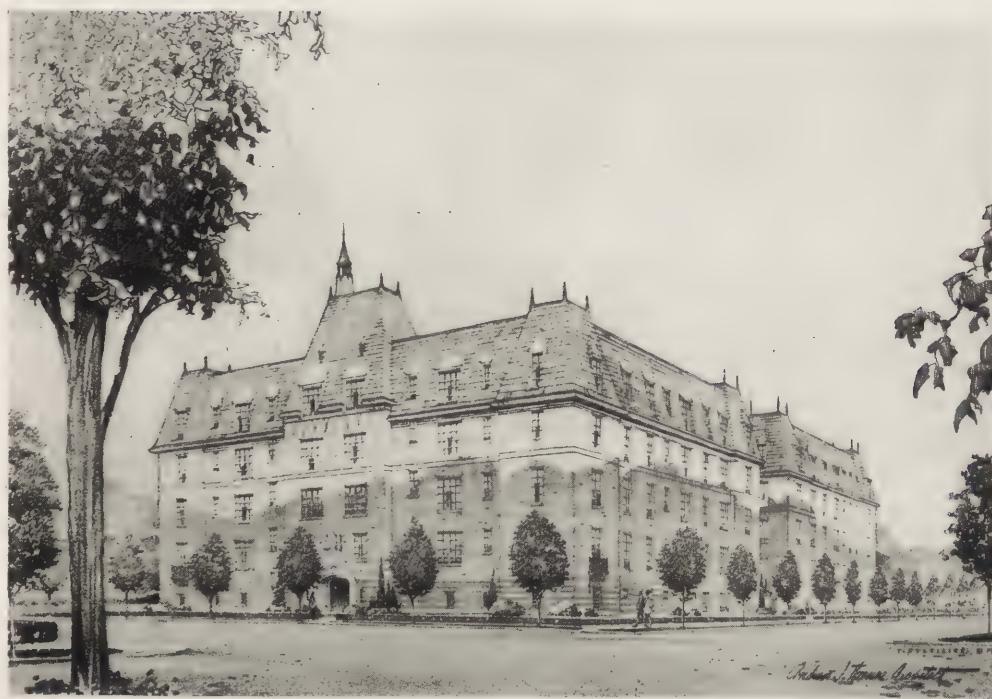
TWO GROUPED APARTMENT BUILDINGS FOR THE HAYES AVENUE APARTMENTS, INC., JACKSON HEIGHTS, NEW YORK CITY.
